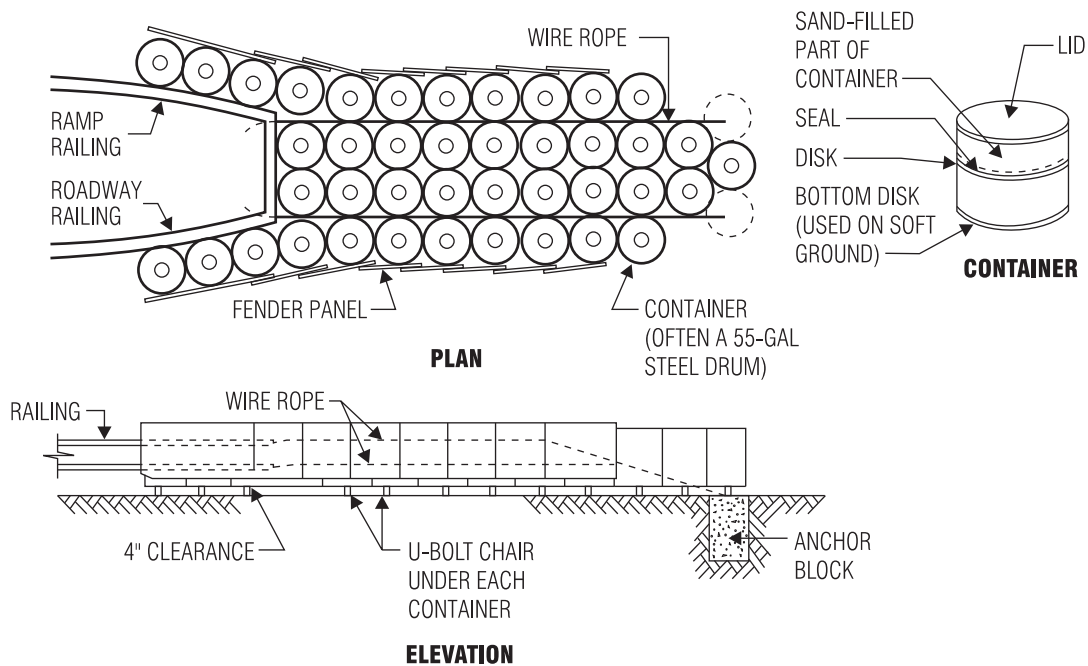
Containers filled with sand used as an inertial barrier.
